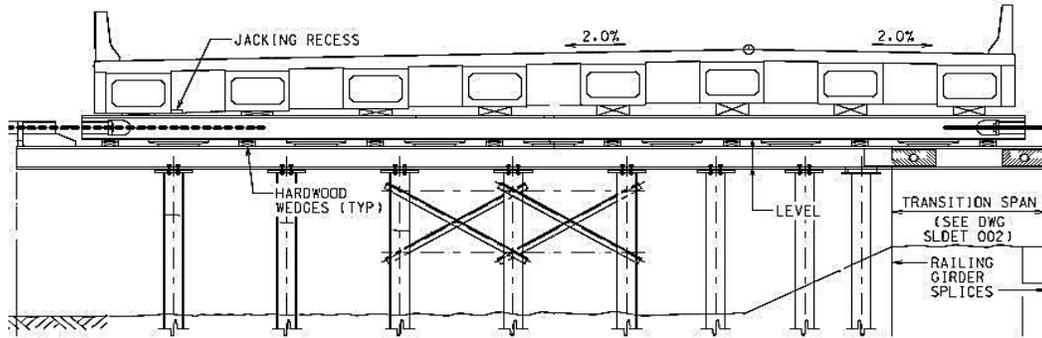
Side view of the US-131 SB bridge temporary substructure
